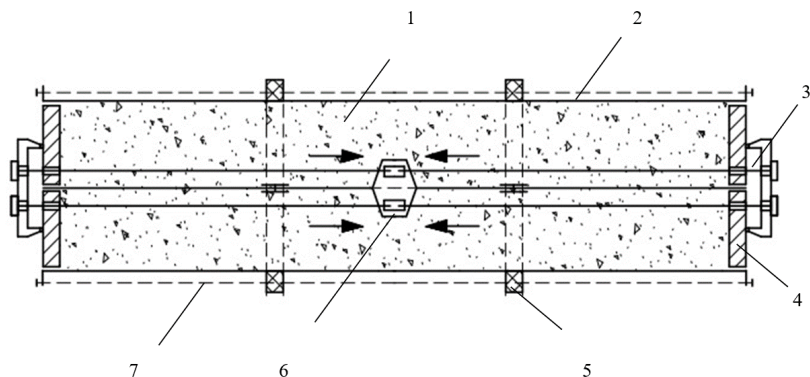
Paired Longitudinally Movable Formwork System During Reinforcement Tensioning on Freshly Placed Concrete Mix
